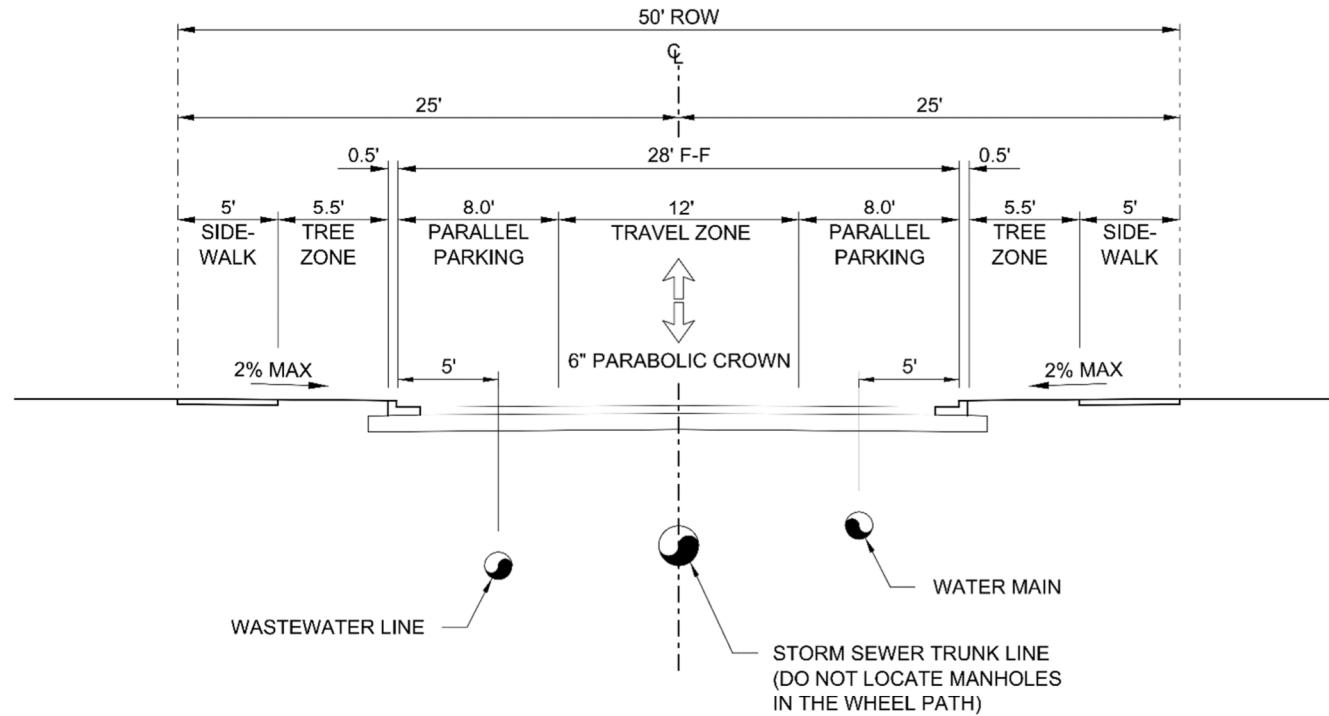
(c) YIELD STREET TYPICAL SECTION
